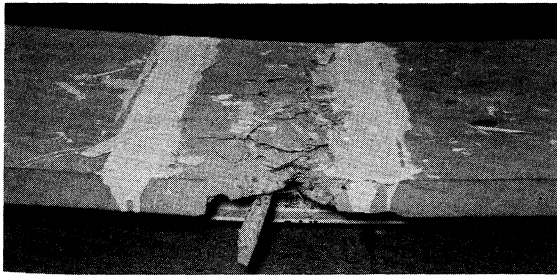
Beam 12 after removal from testing machine. Photo shows typical top view of specimens which failed in flexure.
